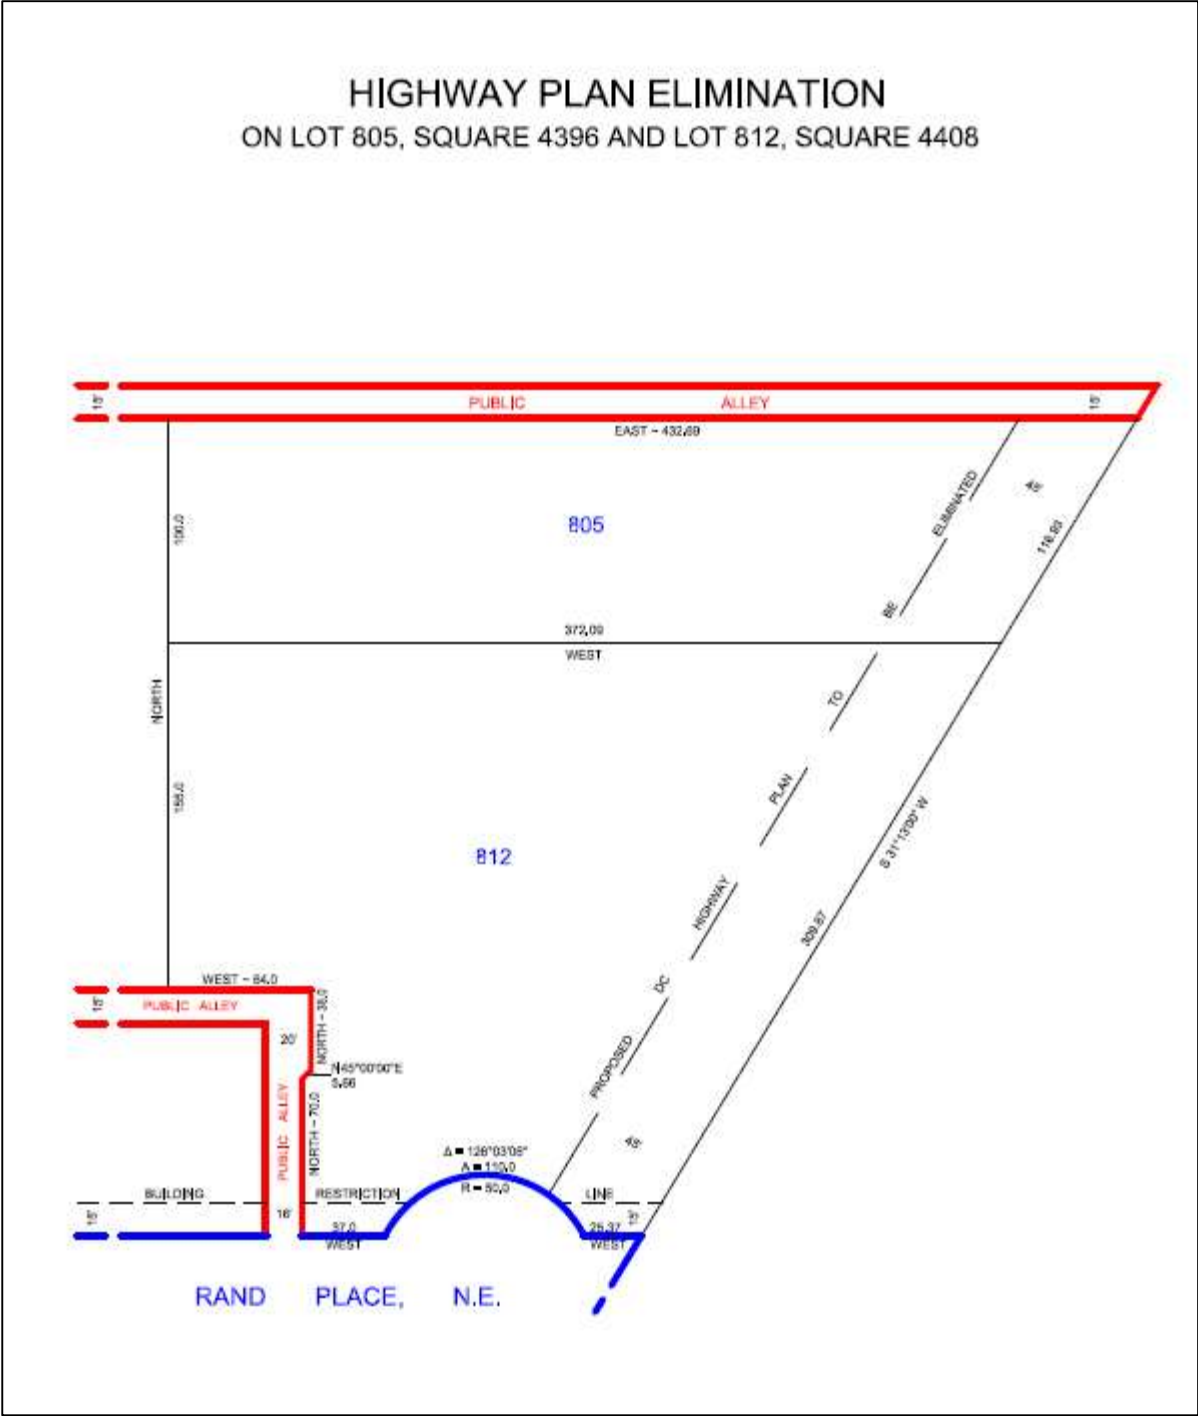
Proposed Removal of Rand Place NE from the DC Highway Plan
